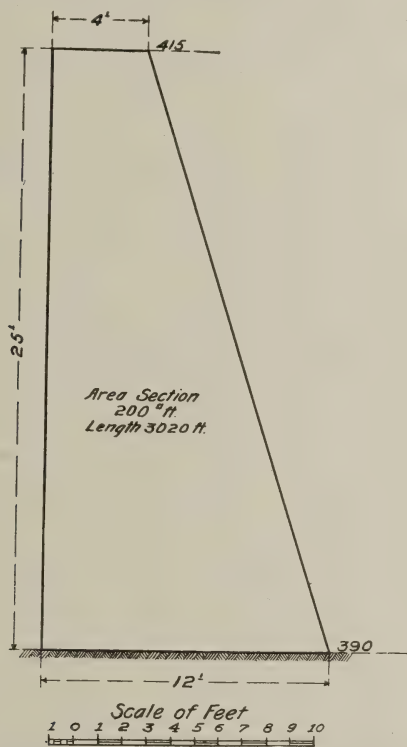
Average section of dike between Pennsylvania Bridge and Ware Rock. This section is much heavier than the full 25-foot head of water requires and is made so to resist the shock of heavy ice striking near the crest.
